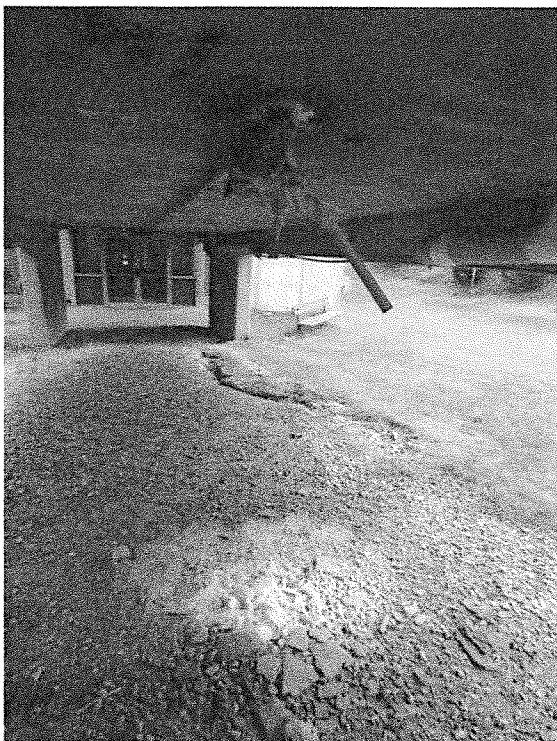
Efflorescence at penetration at underside of pedestrian bridge
